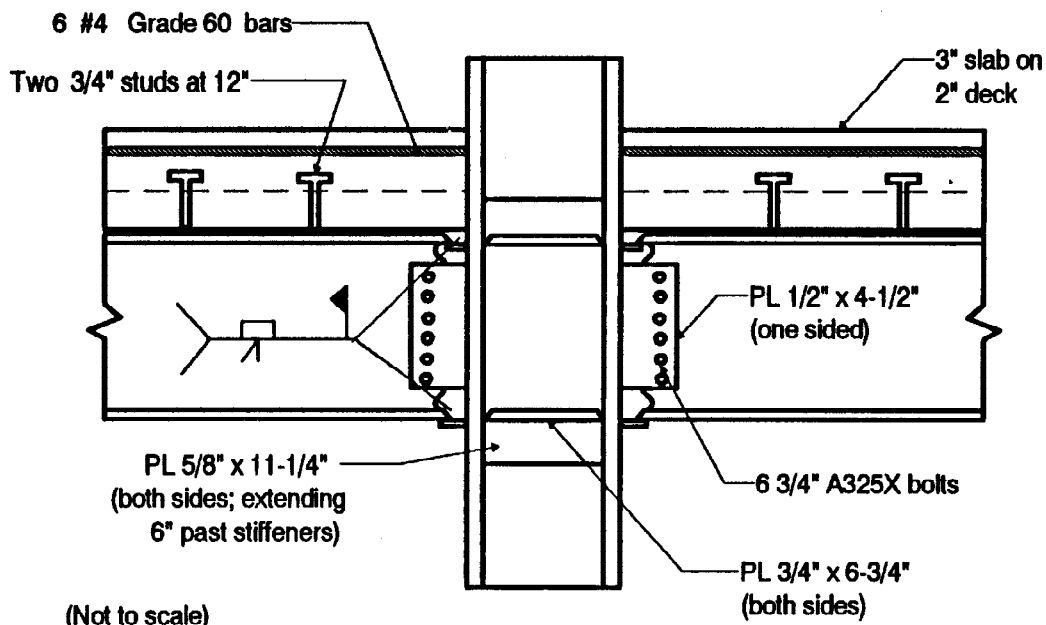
Details of connections tested (Note: Test 1 did not have a slab).
